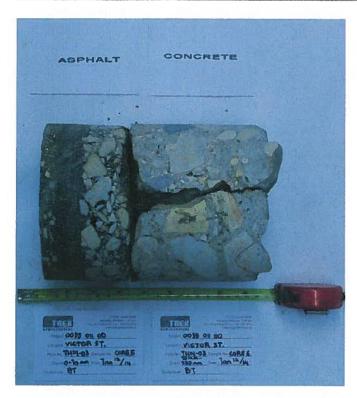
Asphalt and Concrete Core Sample from Test Hole TH14-03
